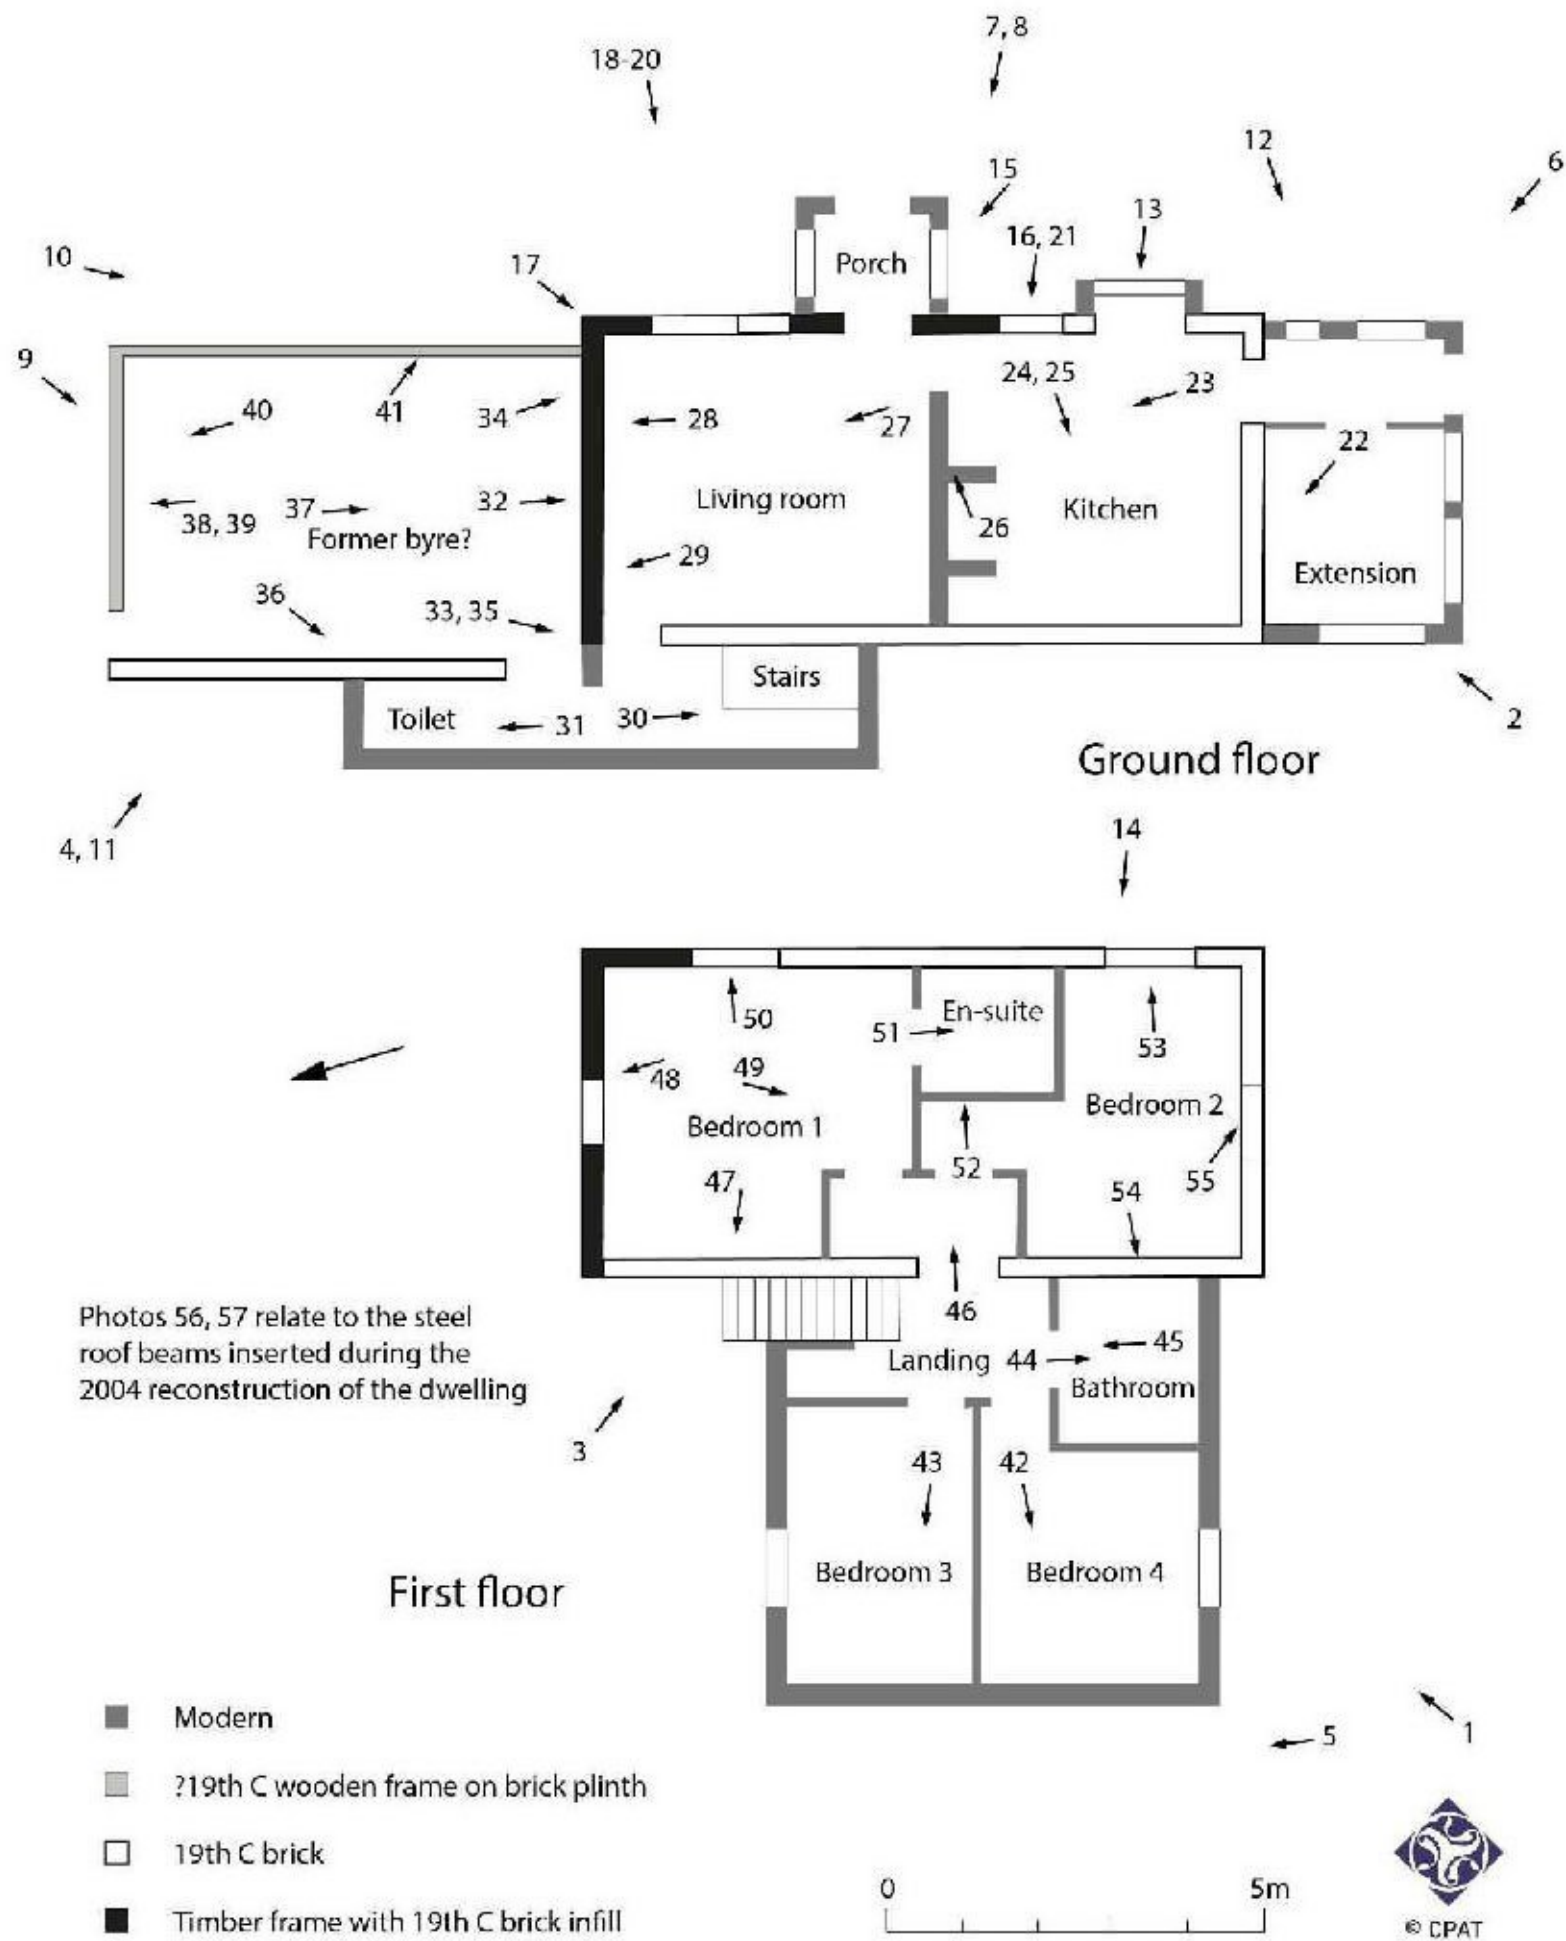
Photo locations (all prefixed by 4900-00 in Appendix 3)
